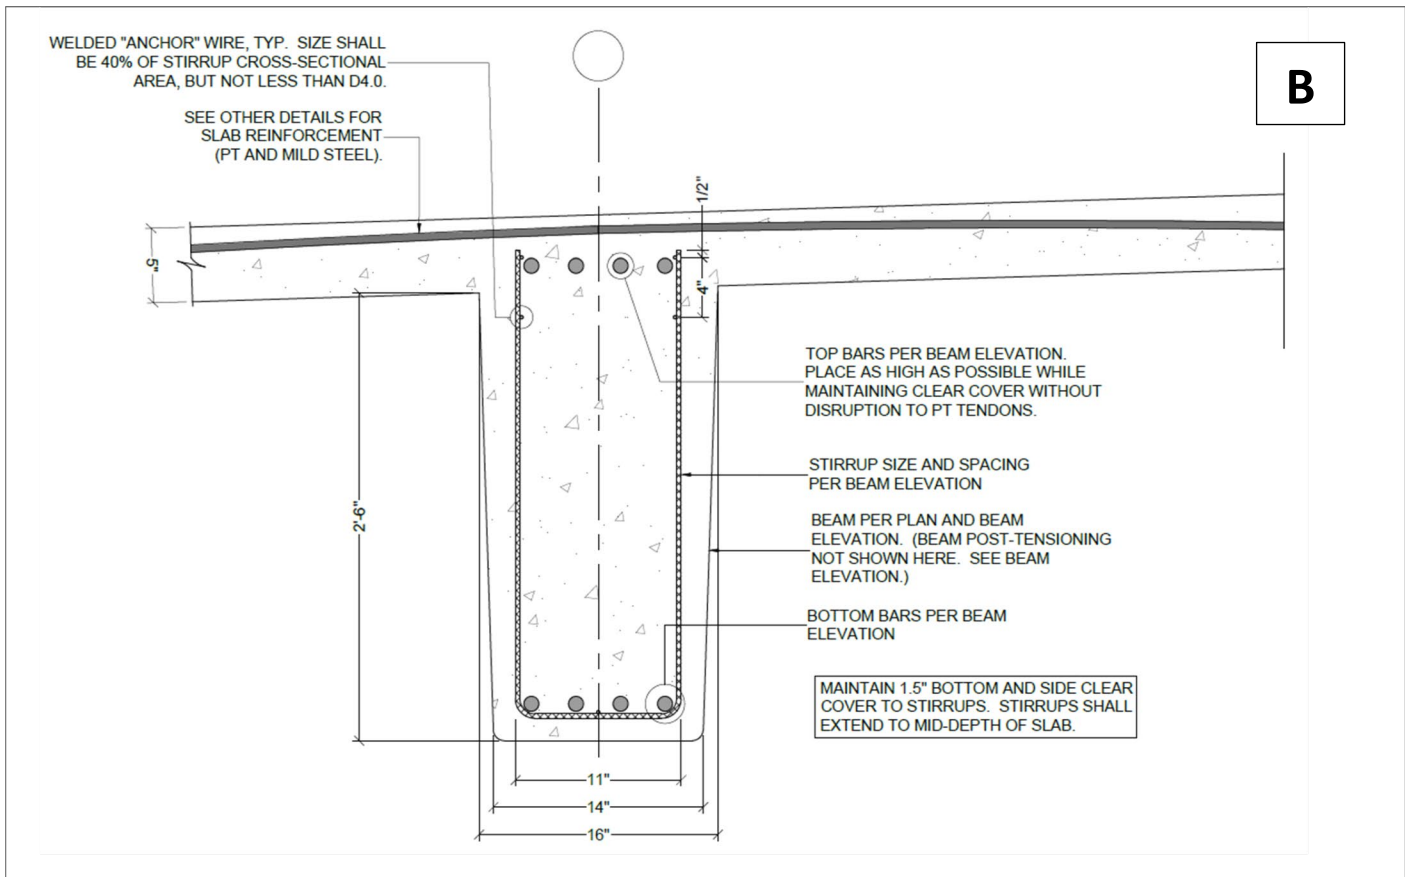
The engineer's contract drawings provide a WWR-specific section showing the U-stirrup with welded intersection curtailment in the compression zone. Sufficient structural geometry is furnished for the WWR detailer to derive the stirrup geometry itself.
